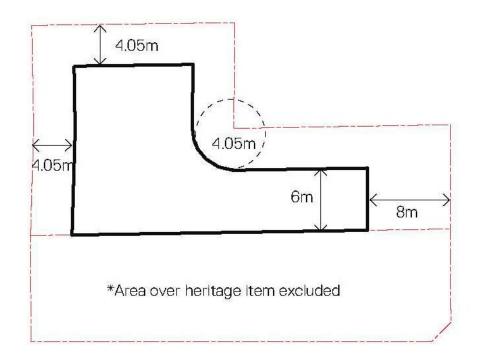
Base Case Tower Architectural Plan (Appendix E – 757-763 George Street Draft Urban Design Report)
